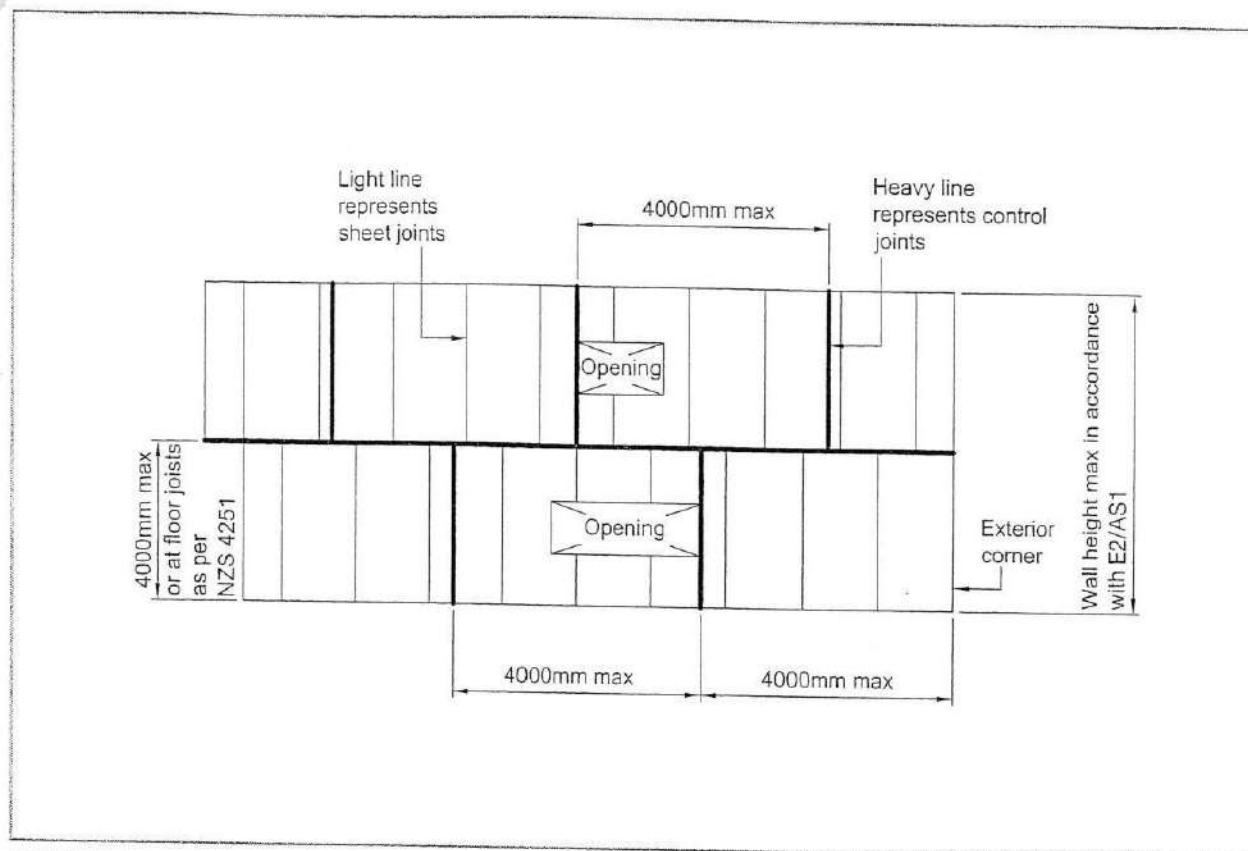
STUCCO CONTROL JOINT SETOUT
